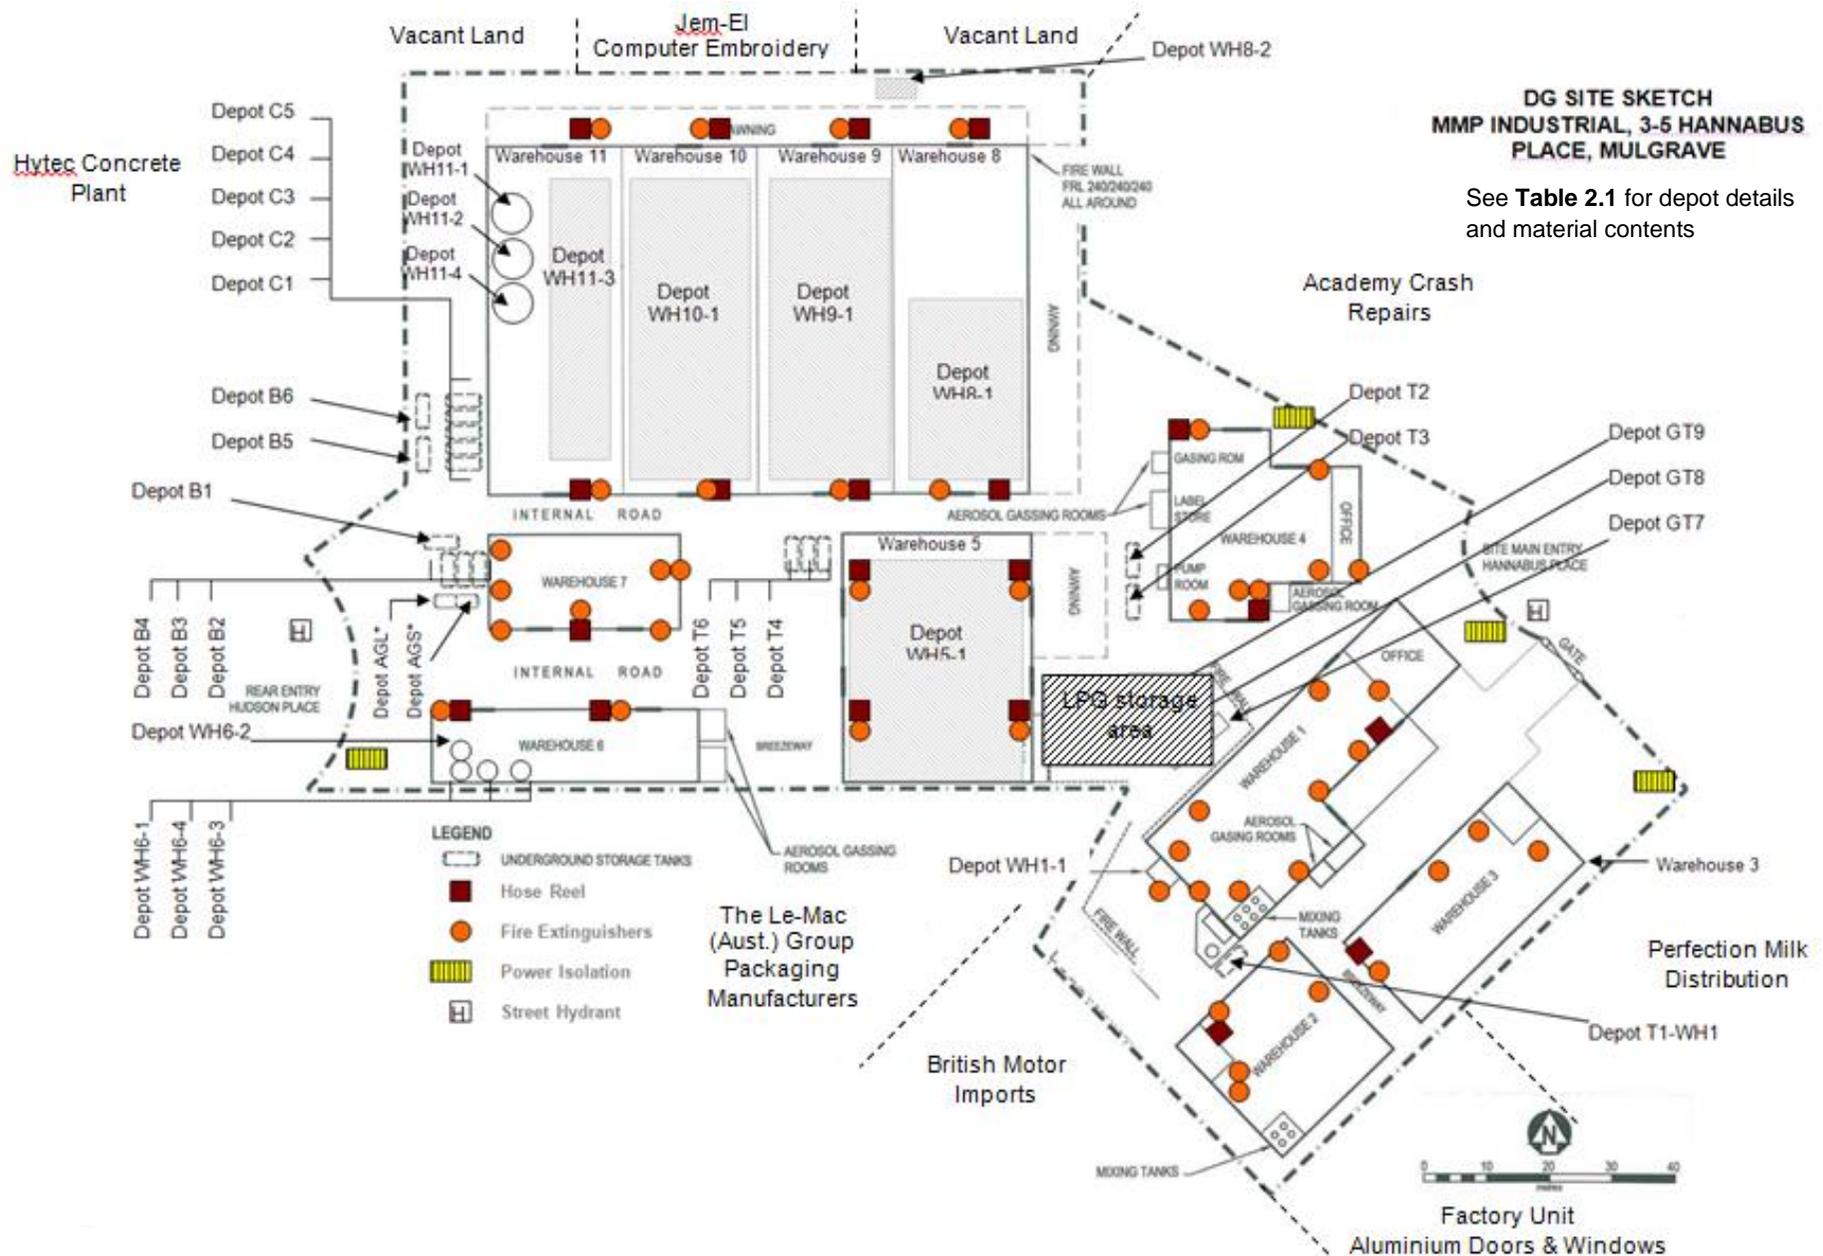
Site Layout of the MMP Facility Showing Adjacent Properties
